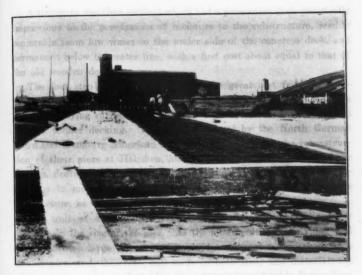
STRIP OF CONCRETE DECK AND STENL REINFORCEMENT.
